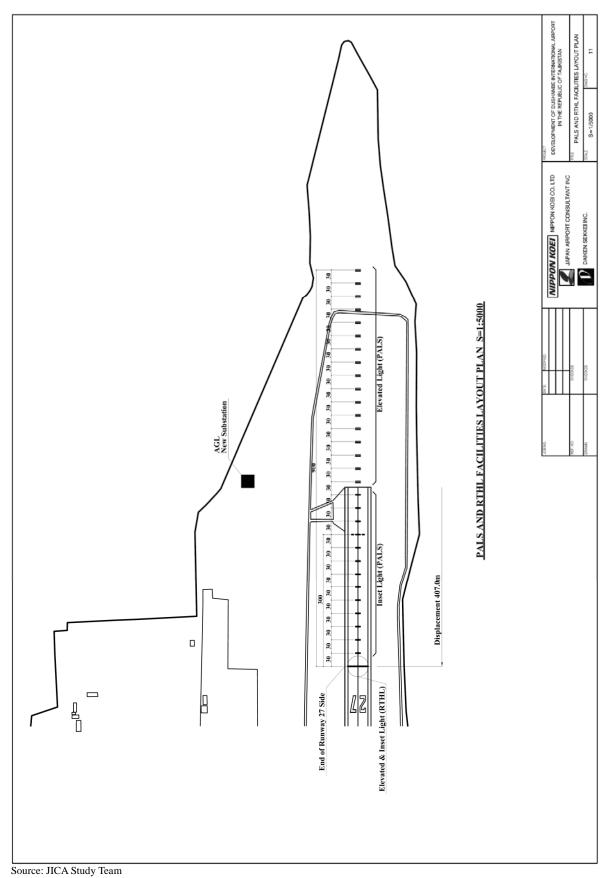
PALS and RTHL Facilities Layout Plan
